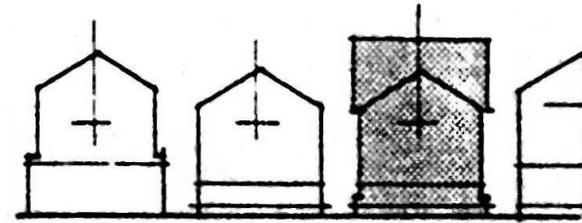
New building emphasizes the height, scale, and roof forms of adjacent buildings.
